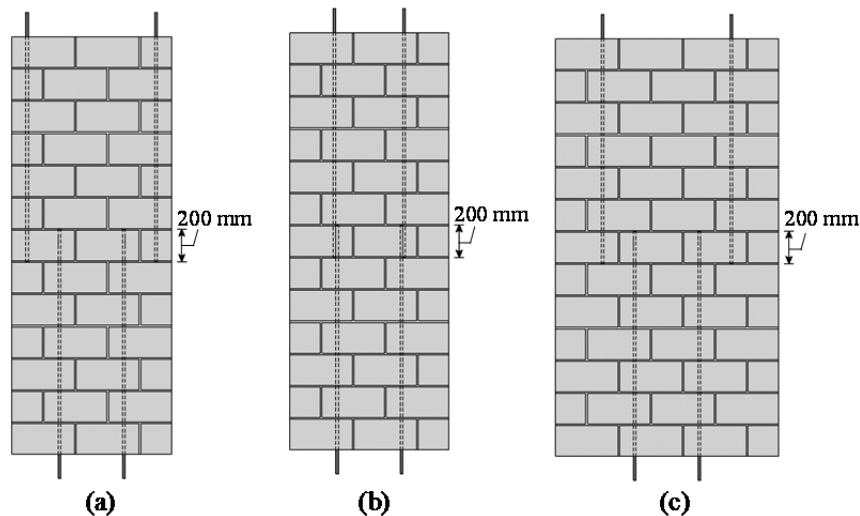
Wall Elevations: (a) NCLS, (b) CLS, and (c) GCC Specimens.
